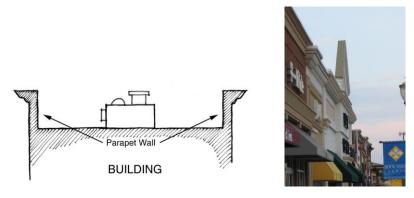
The image on the left illustrates the use of parapet walls to screen mechanical equipment. Tall, thin parapets such as the one shown in the image on the right should be avoided to prevent the appearance of false walls.
